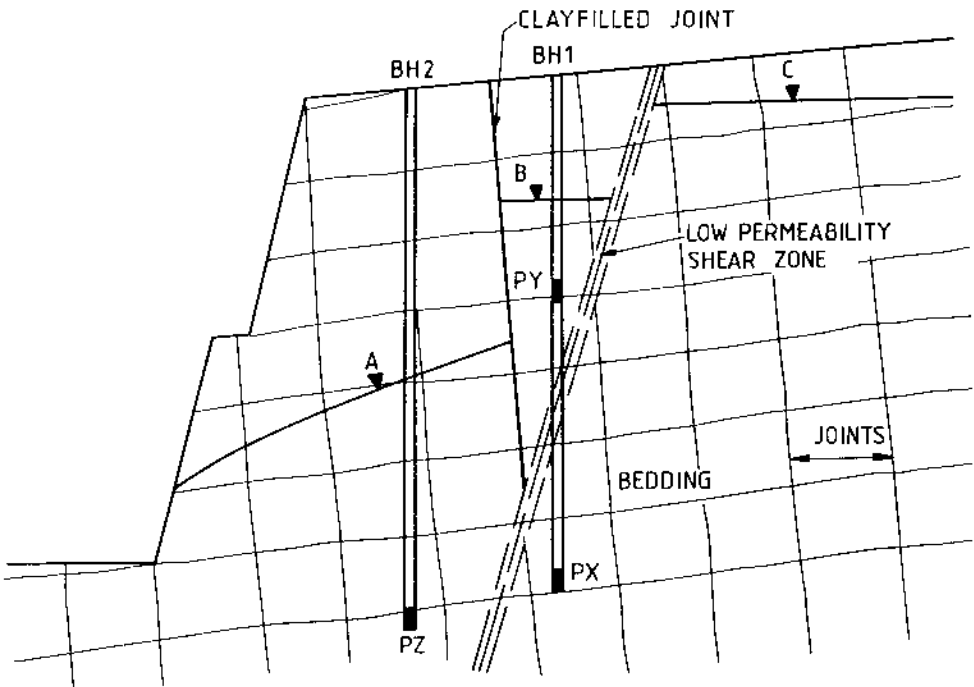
Piezometric conditions in jointed and sheared rock.
